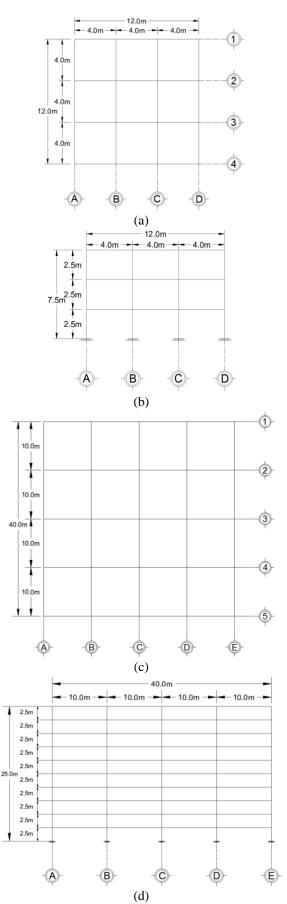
(a) Plan, 3 levels building (b) Elevation, 3 levels building (c) Plan, 10 levels building (d) Elevation, 10 levels building
